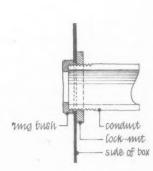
(far left), method of connecting conduit to a sheet steel box.
